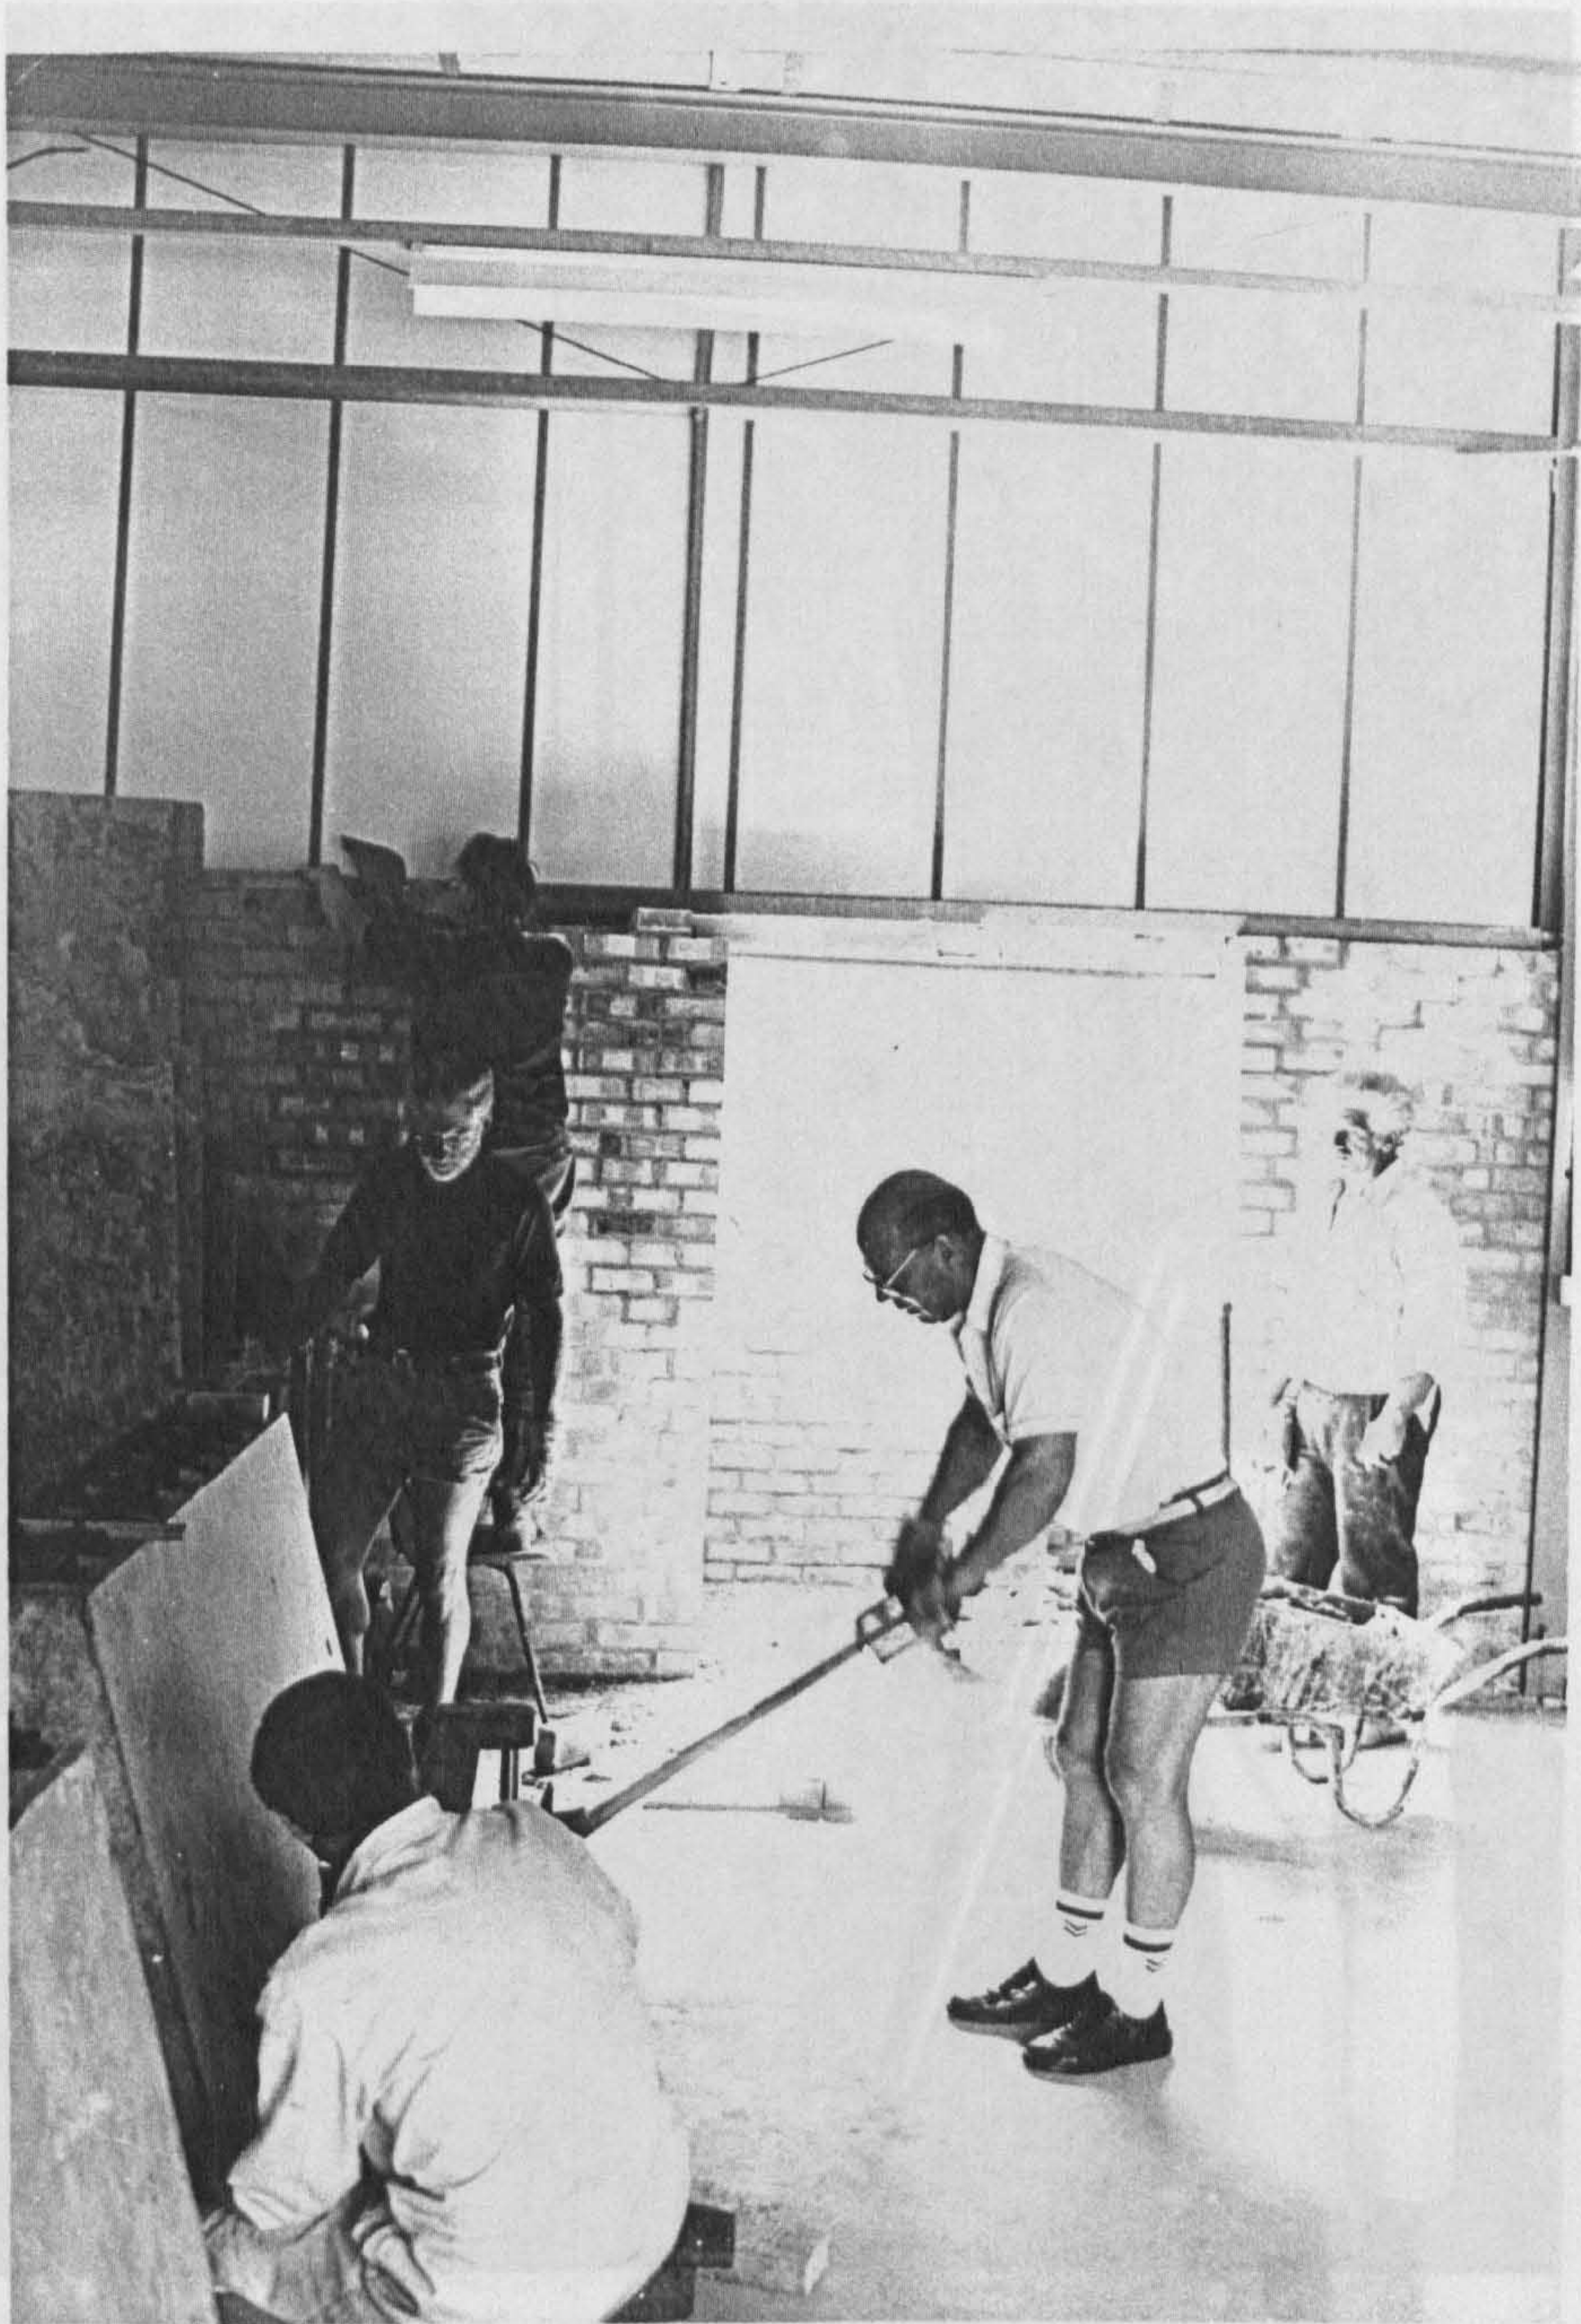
Using a hydraulic jack to place the concrete blocks into position. Note that this was done whilst the original wind tunnel had been split in two halves prior to building the extension to the working section.
